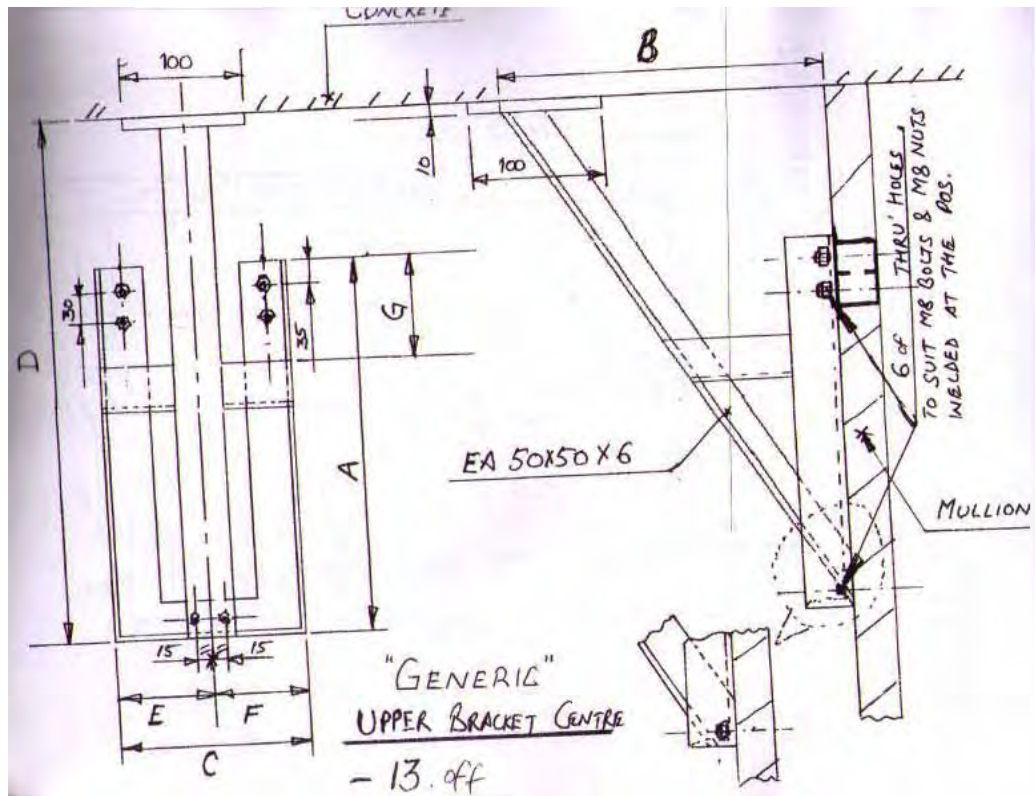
Sketch of upper U-bracket connecting mullion from internal of level 28 using six bolts.
